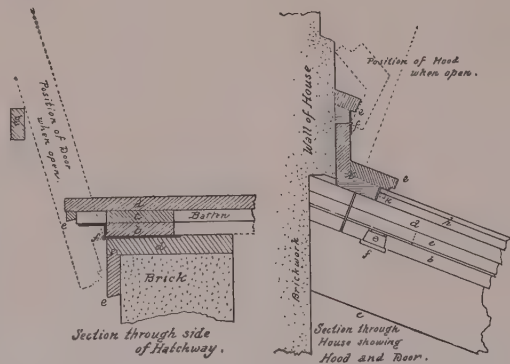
Sketch showing the weather-light construction of a bulkhead or hatchway door
